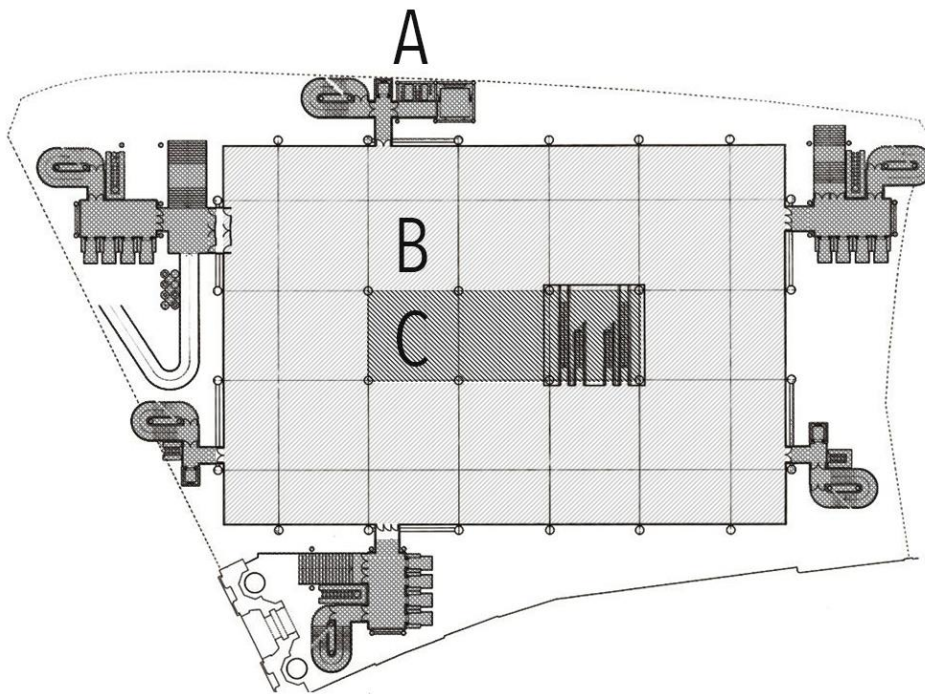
Structural analysis of a typical floor plan of the Lloyd's Building (1986), London, architect: Richard Rogers & Partners. Designations: A - vertical communication-sanitary zone, B - office space zone, C - inner atrium zone. Source: Ariza H. 2014.
